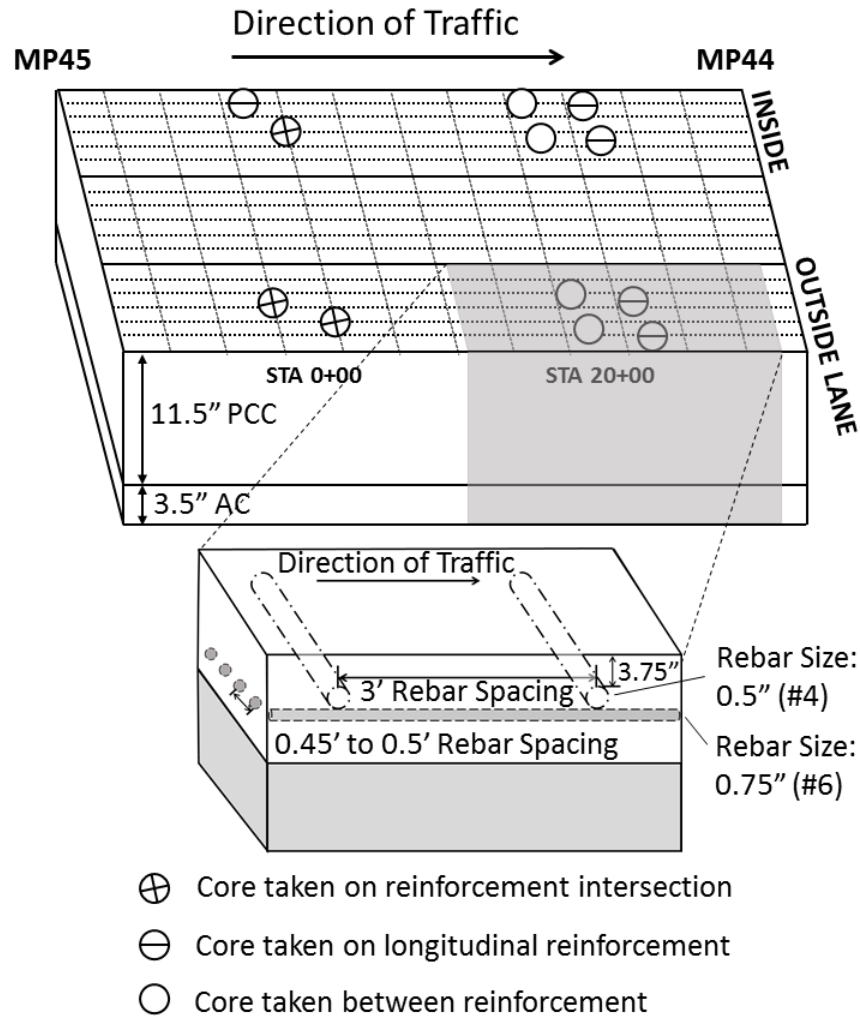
3D View of Pavement Design Parameters for Fair CRC (I-85 MP 45-44)
